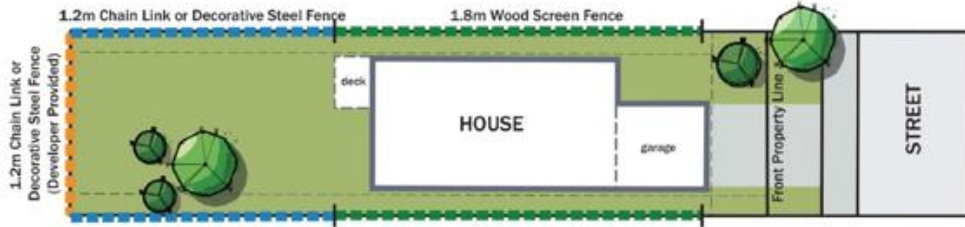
Fencing Plan – Stormwater Management Facility, Neighbourhood Parks and Walkway Lots
